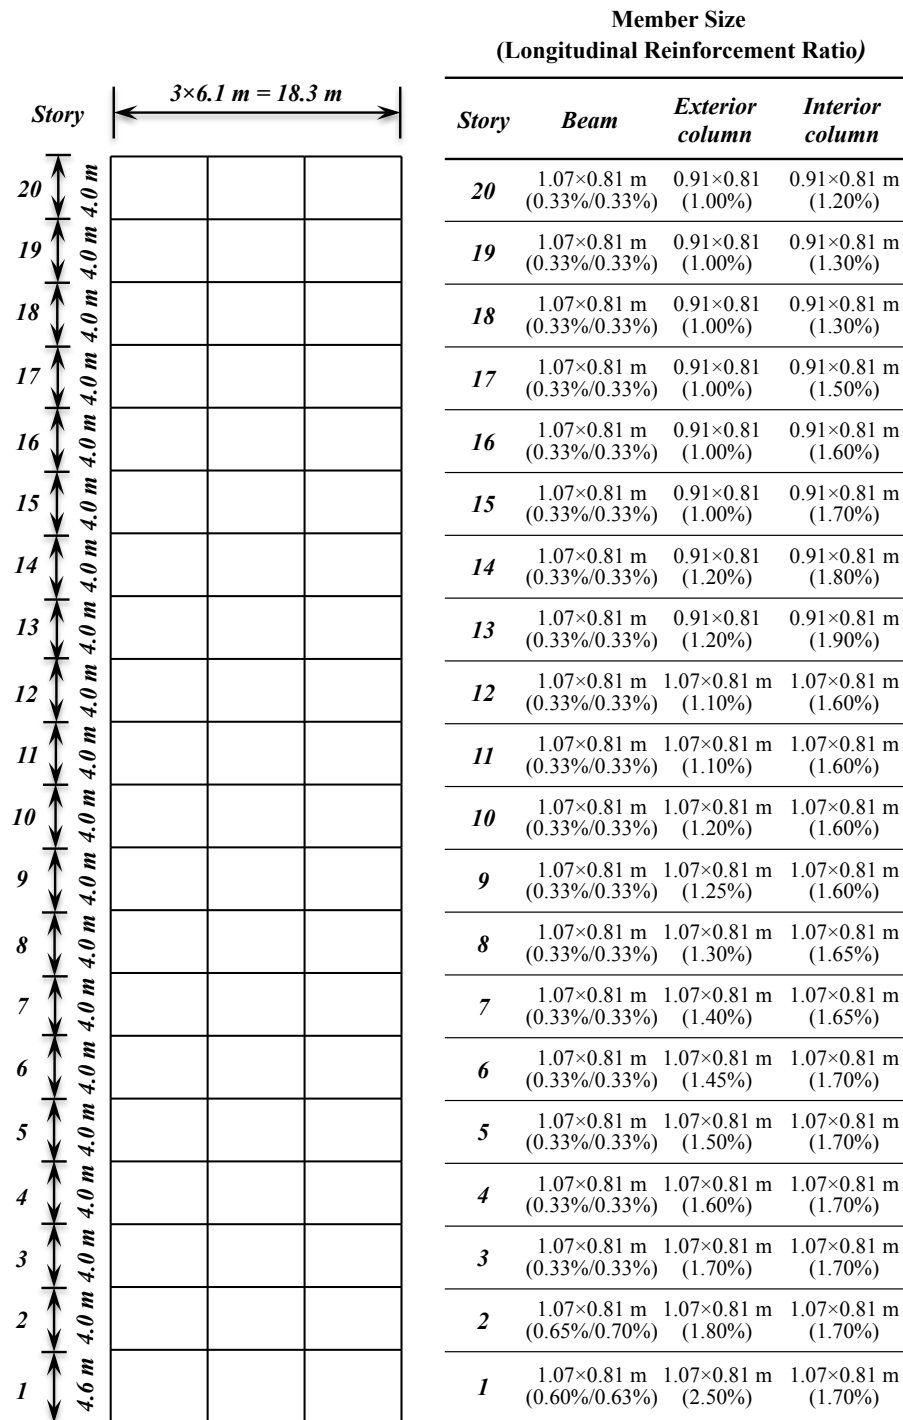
Elevation of building RC-8 as well as the member size and reinforcement ratio of the beams and columns.
